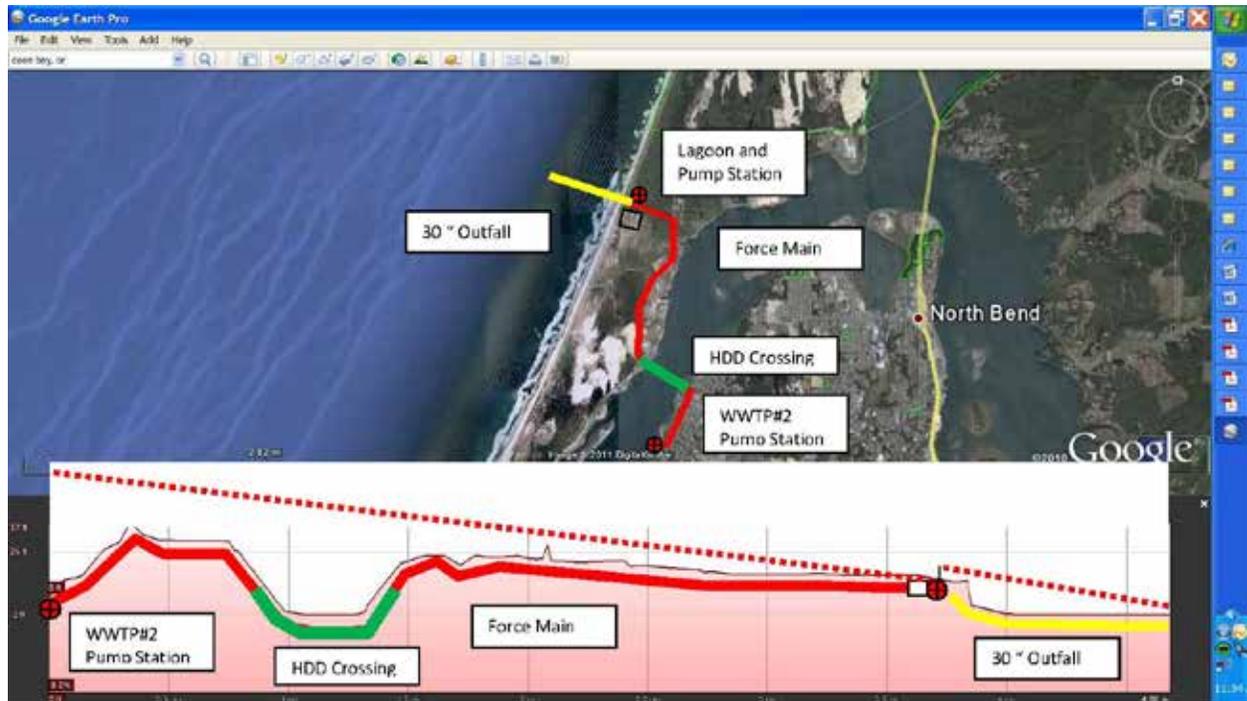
Project Site, Effluent PS, Force Main and Outfall Structure
